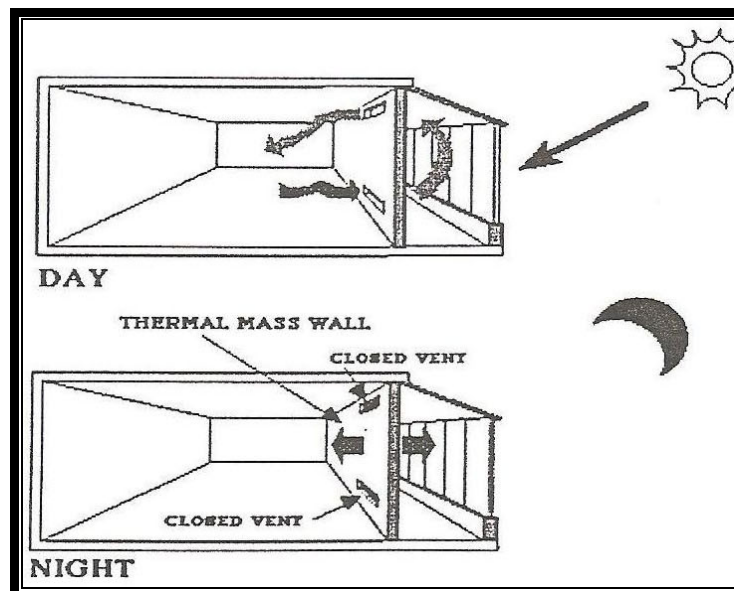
Sunroom and Thermal Mass Wall an Air Collector of a Storage System in The House. (Said, S, N, B. 2004. 16)
